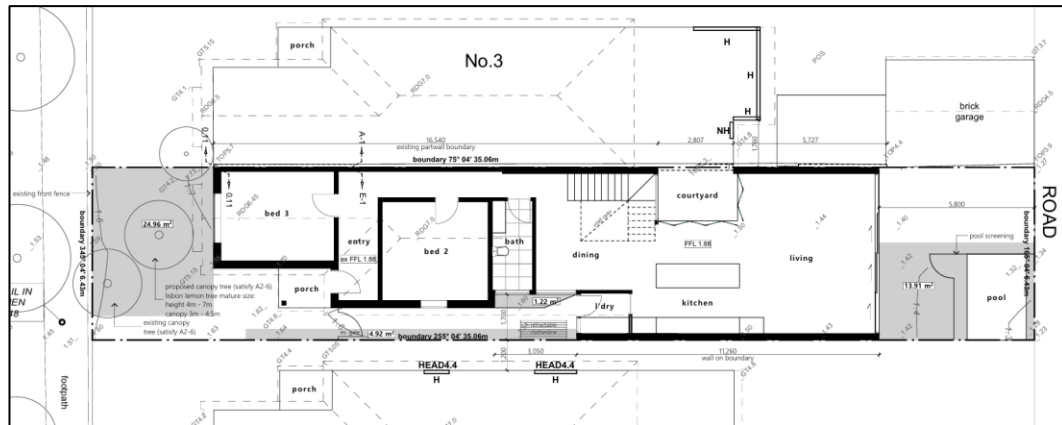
Extract of the proposed ground floor plan of 4 Lytton Street (endorsed under P DPL/00528/2025/A)
